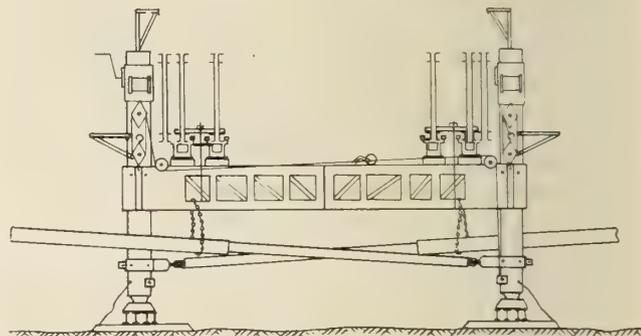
The trestle is assembled and fastened to the nose of the bridge by trestle suspension slings; the winches are rigged to raise one leg.
